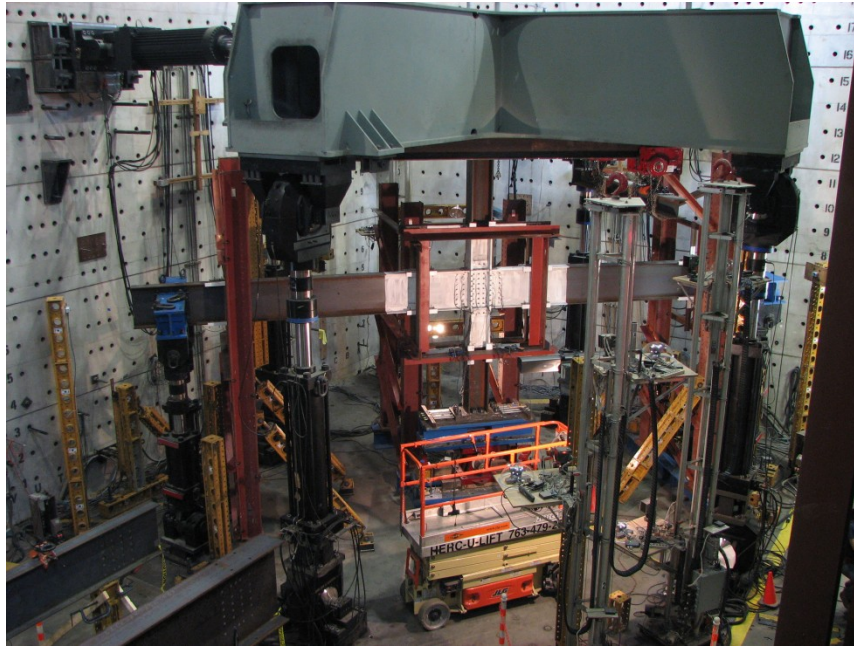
Test setup of Specimen 8 in the laboratory – global view
